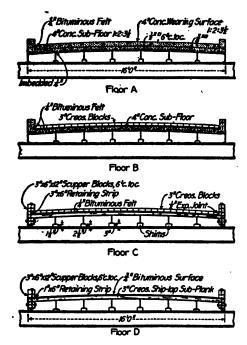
Standard Highway Bridge Floors, Illinois Highway Commission.
